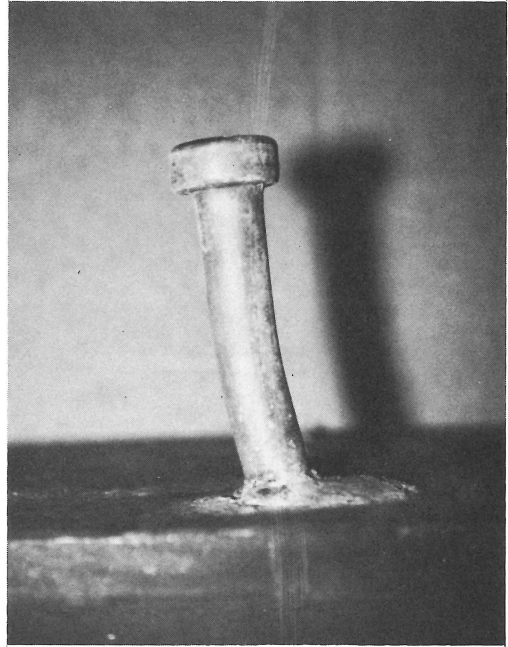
Condition of Connectors After Concrete Failure.
